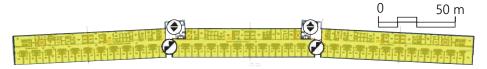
Layout arrangement of the sixth floor. HUCA.
